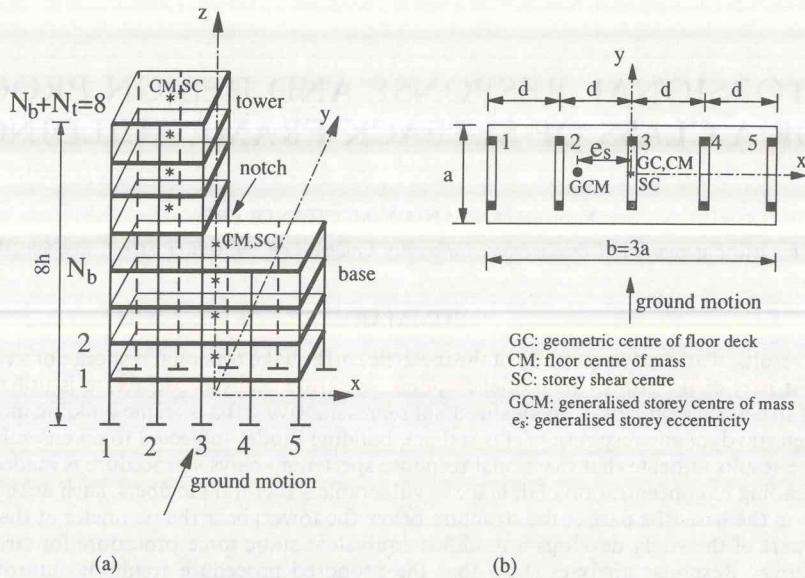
(a) Idealized setback frame building model, and (b) plan view of the base
